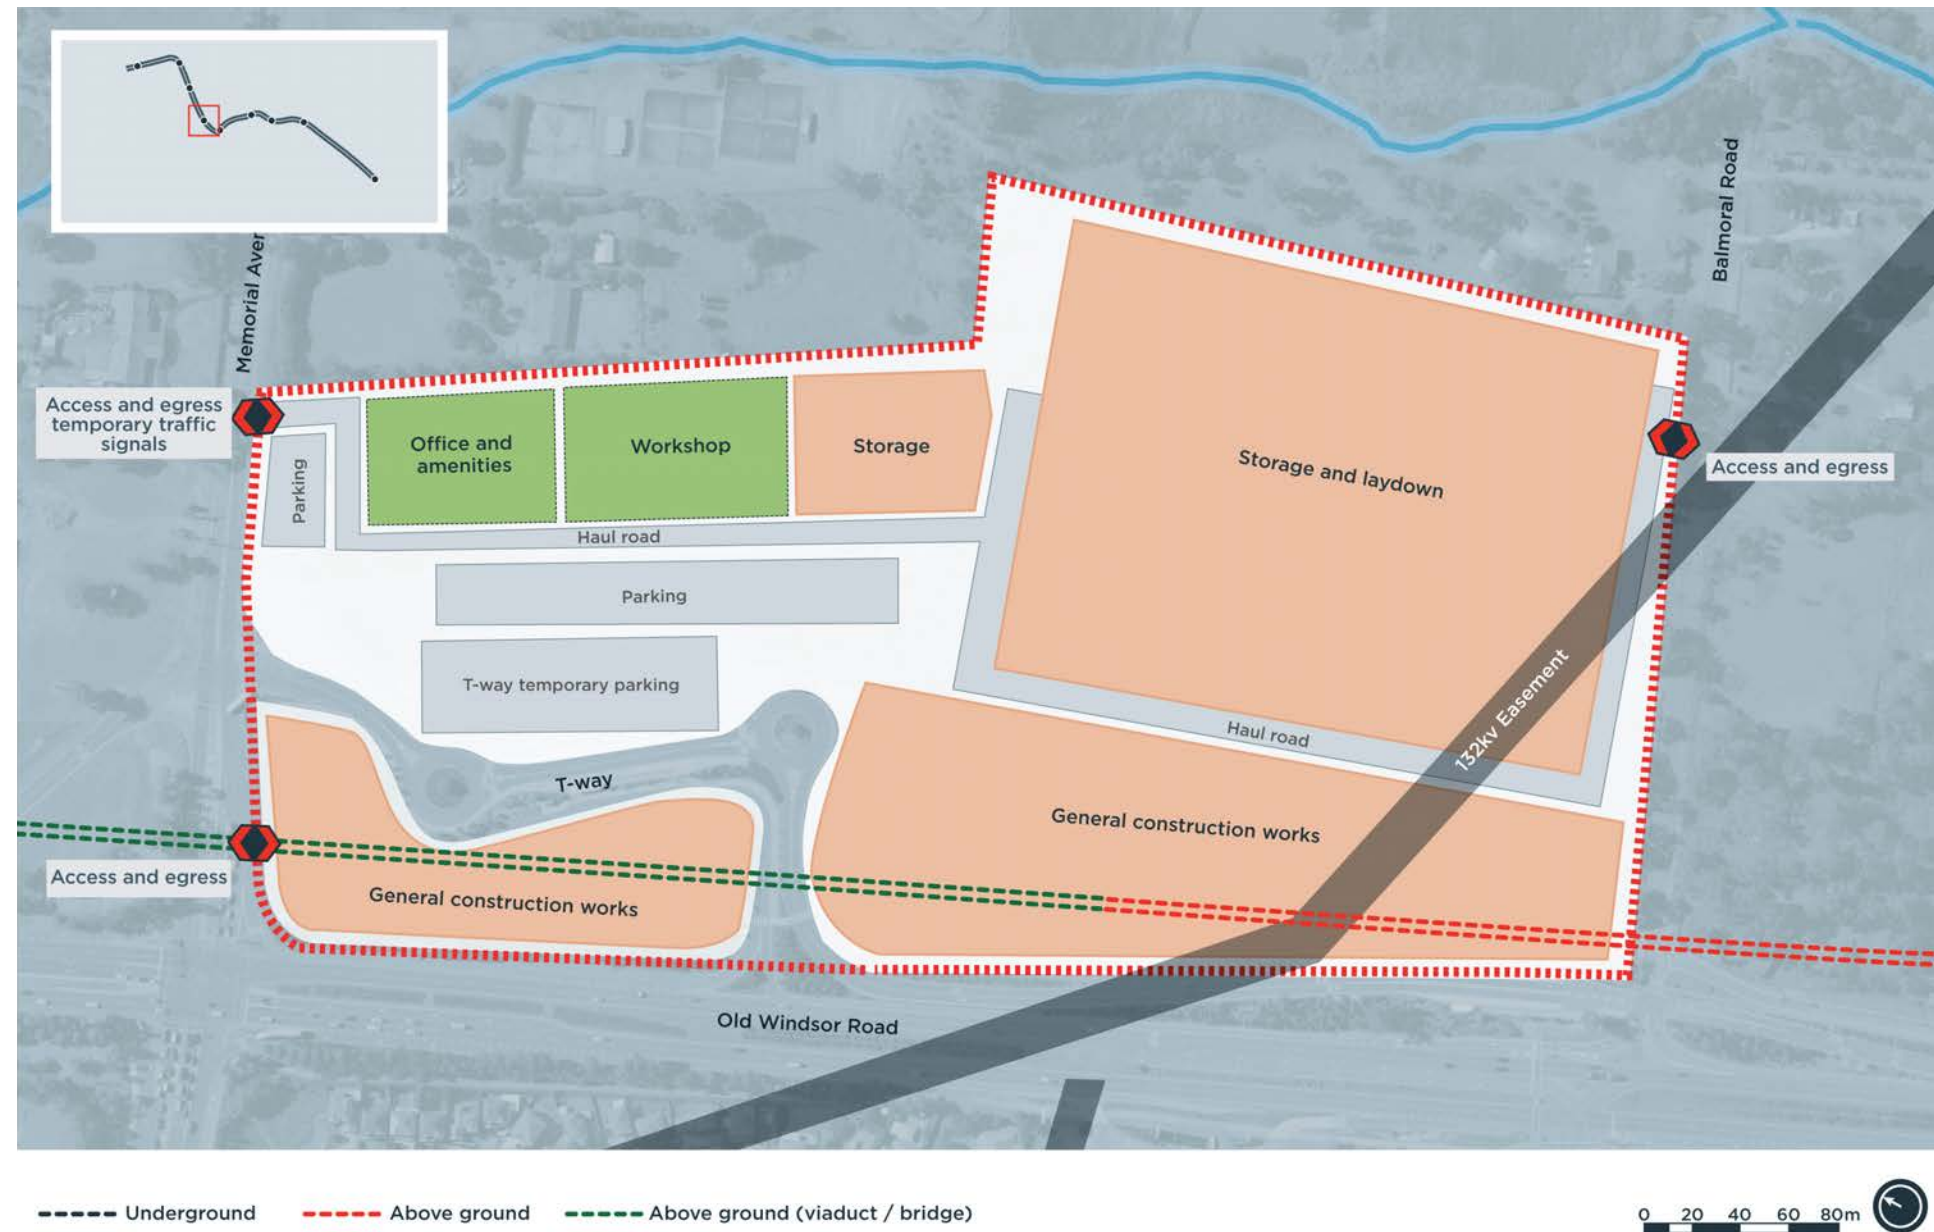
Samantha Riley Drive to Windsor Road construction site layout
